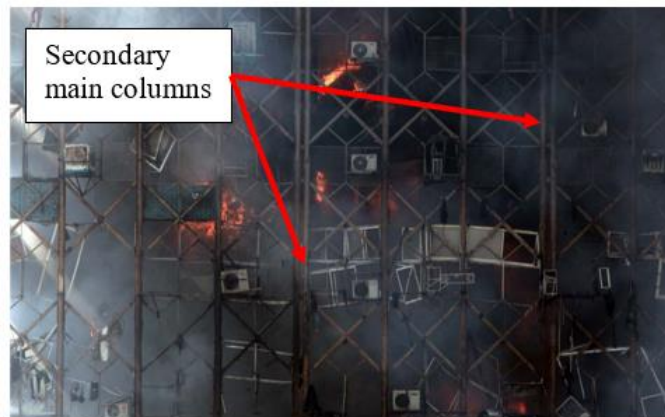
Photo showing the Northern elevation of the tower under a fully grown fire over multiple floor levels.
